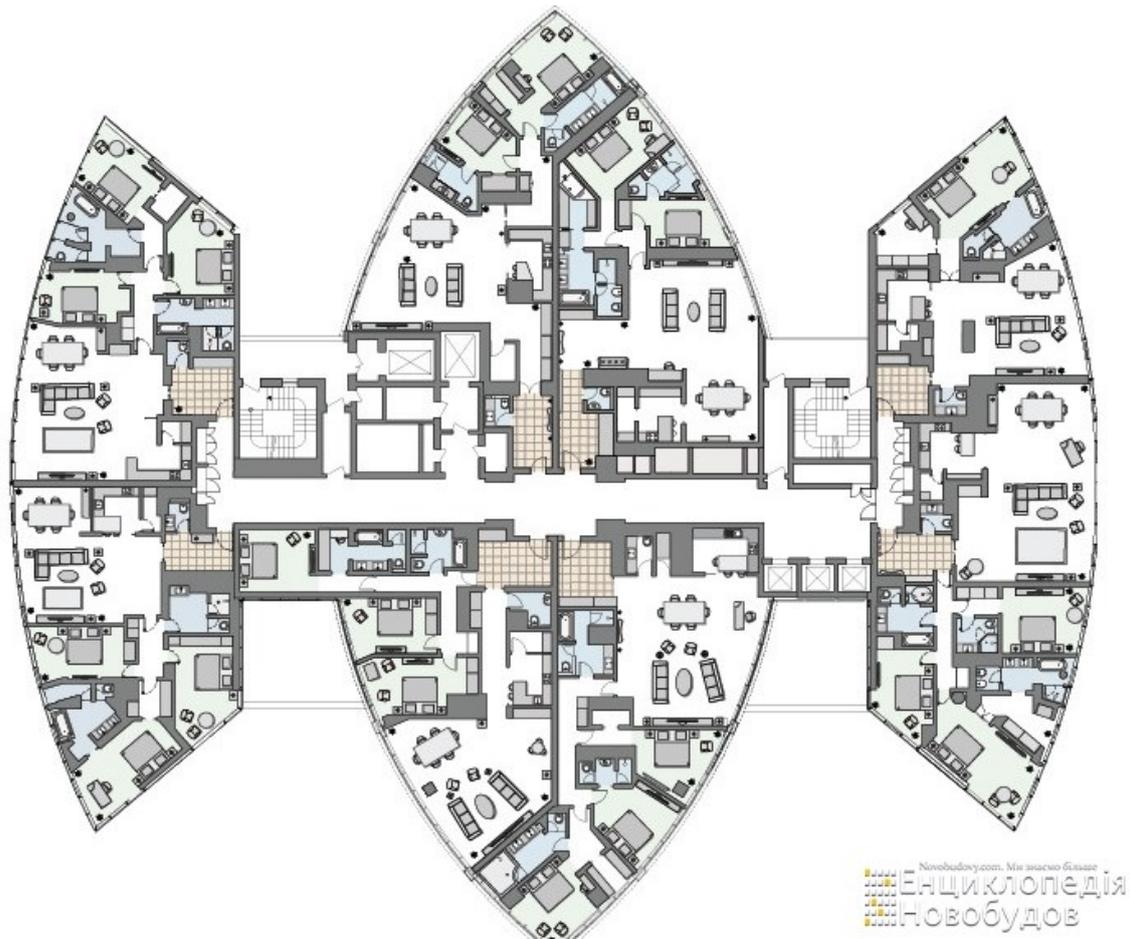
Hotel and residential complex H-Tower on Tarasa Shevchenka Boulevard, Kyiv, Ukraine (designed by Sifert Architects LLC, 2013). Plan of a typical residential floor [26]
